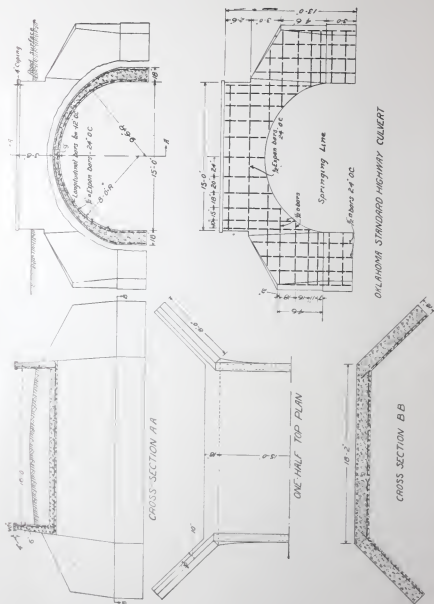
Standard Highway Culvert, Reinforced Concrete 15-foot Arch. Oklahoma State Highway.
